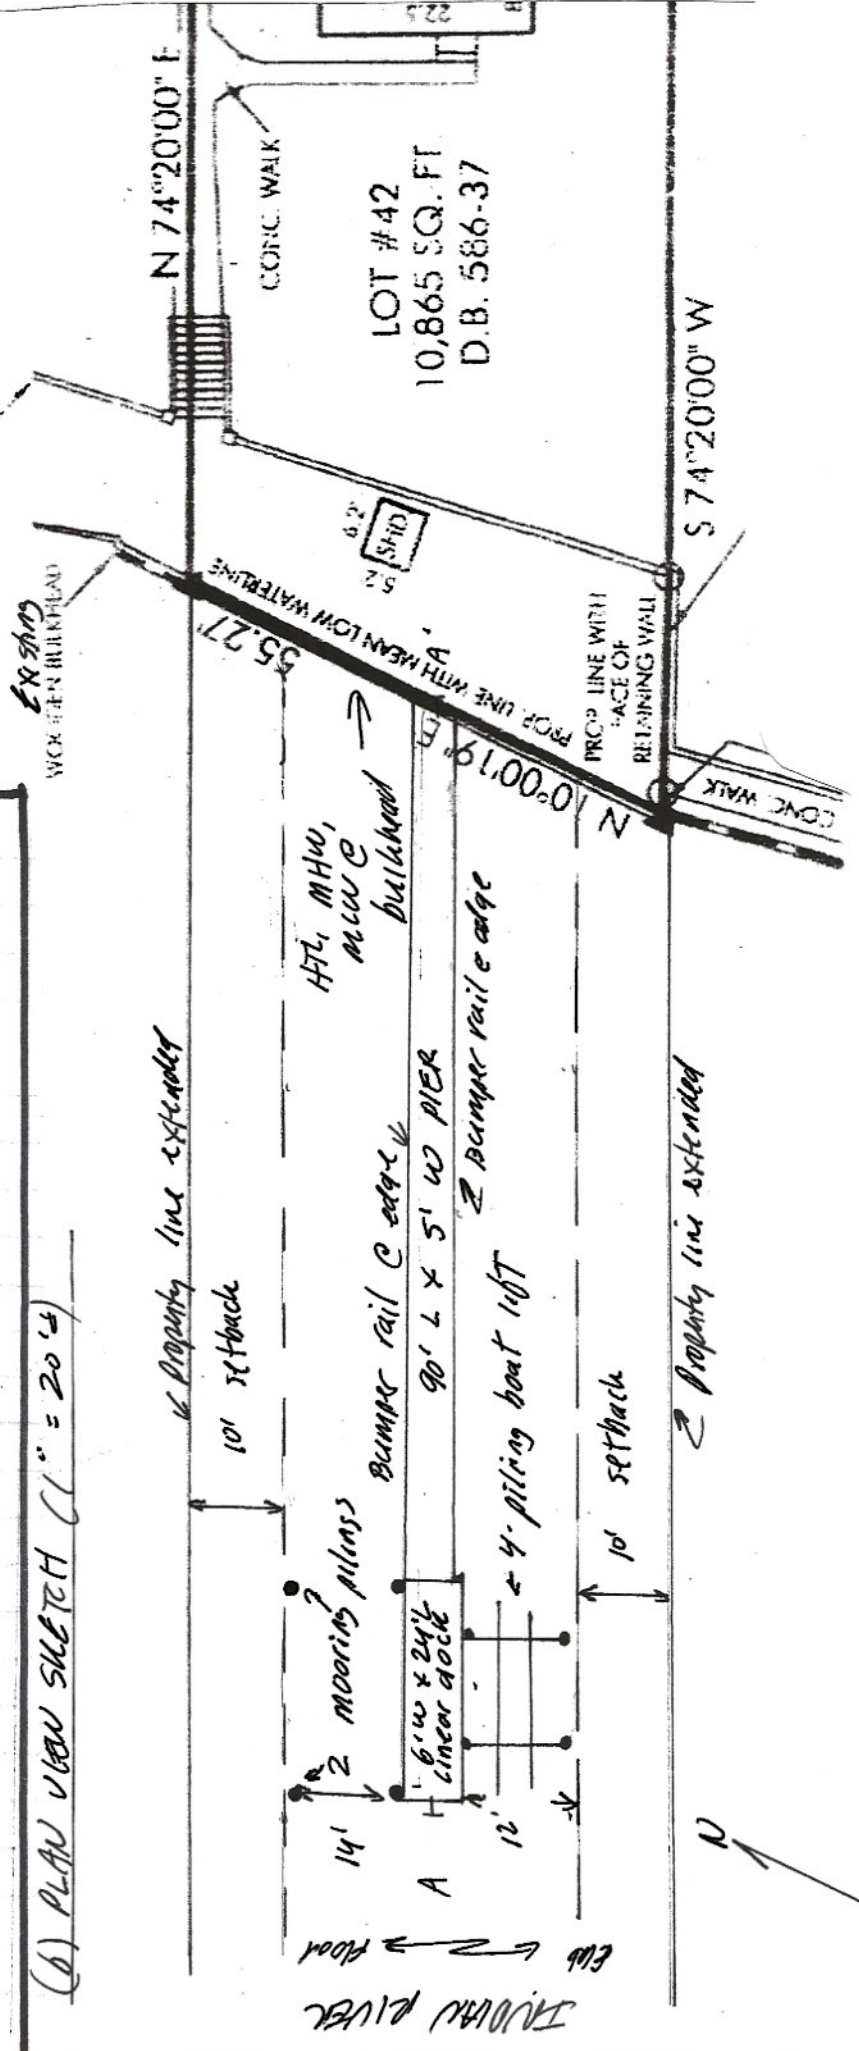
Plan view and cross-section sketches of proposed project. Sketches for permit application purposes only.
